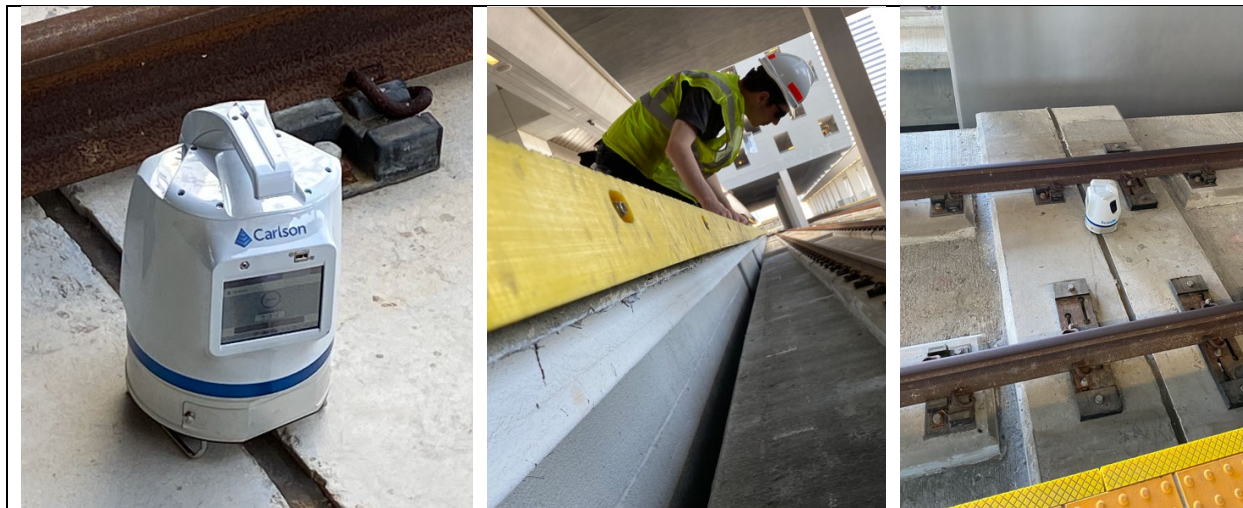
Lidar instrument mapping Tri-Rail platforms at Miami Central Station
